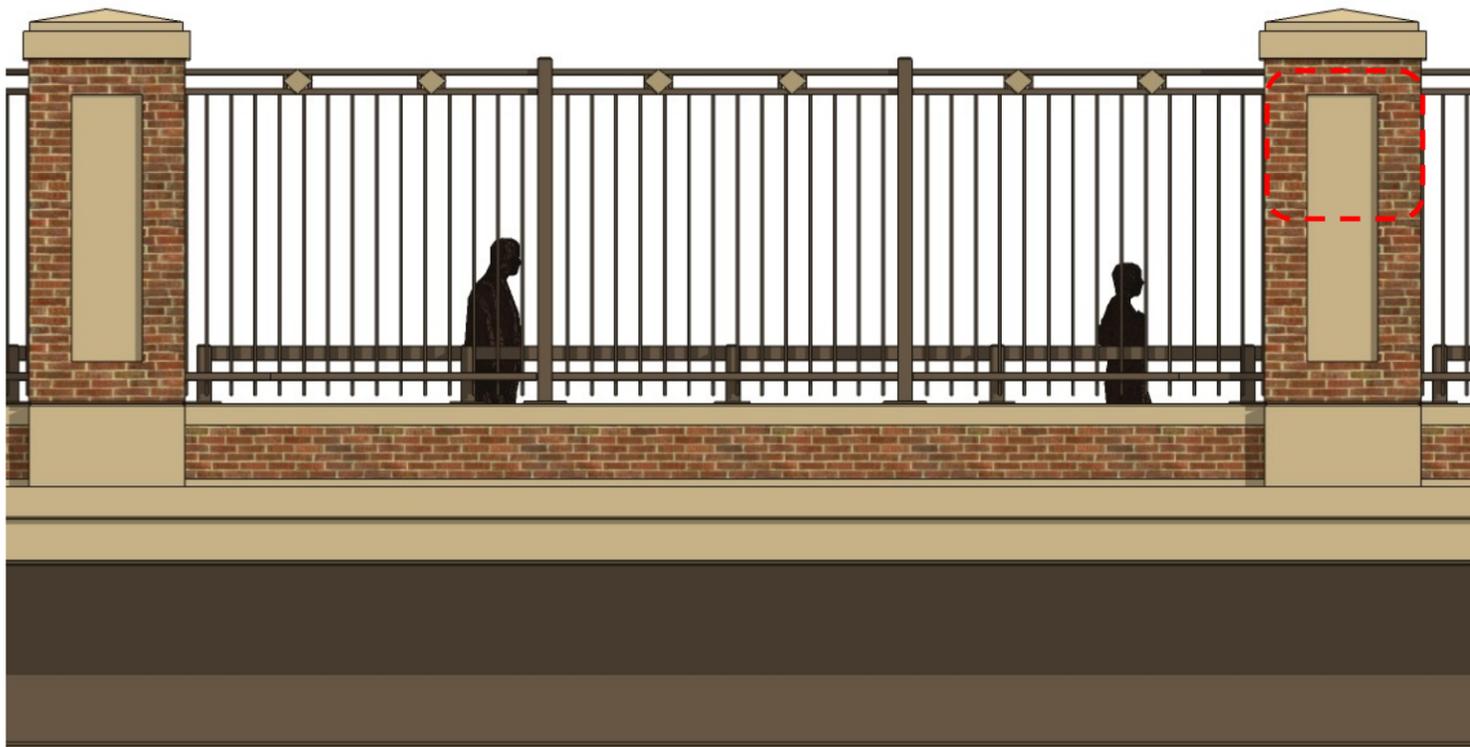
Bridge Pilaster, Ornamental Fence, and Railing - Bridge View
